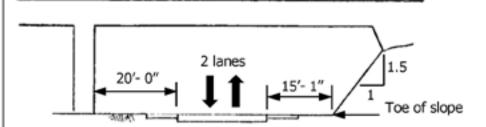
Bridge elevation view of horizontal clearances for a 2-lane highway with 2-way traffic below the bridge.
